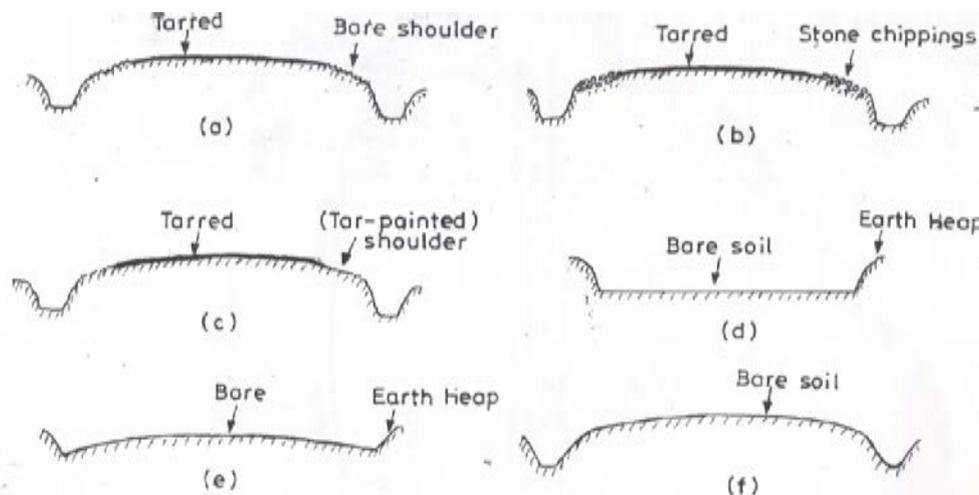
Vertical Cross Sections of Some Existing Roads; (a) – (c) : Tarred Roads (Highways); (d) – (f) Earth (Rural) Roads – Schematic
